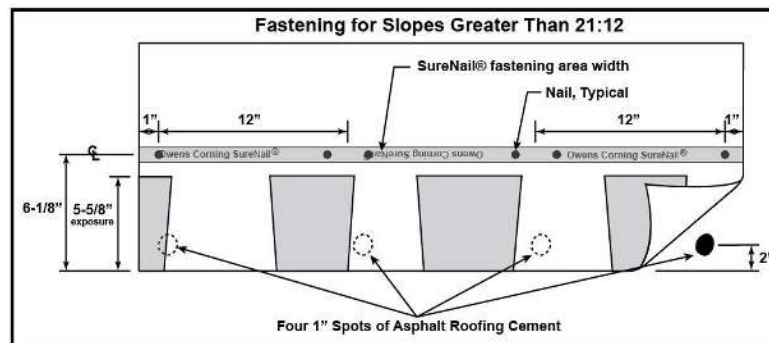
Mansard or Steep-Slope Pattern, Oakridge
